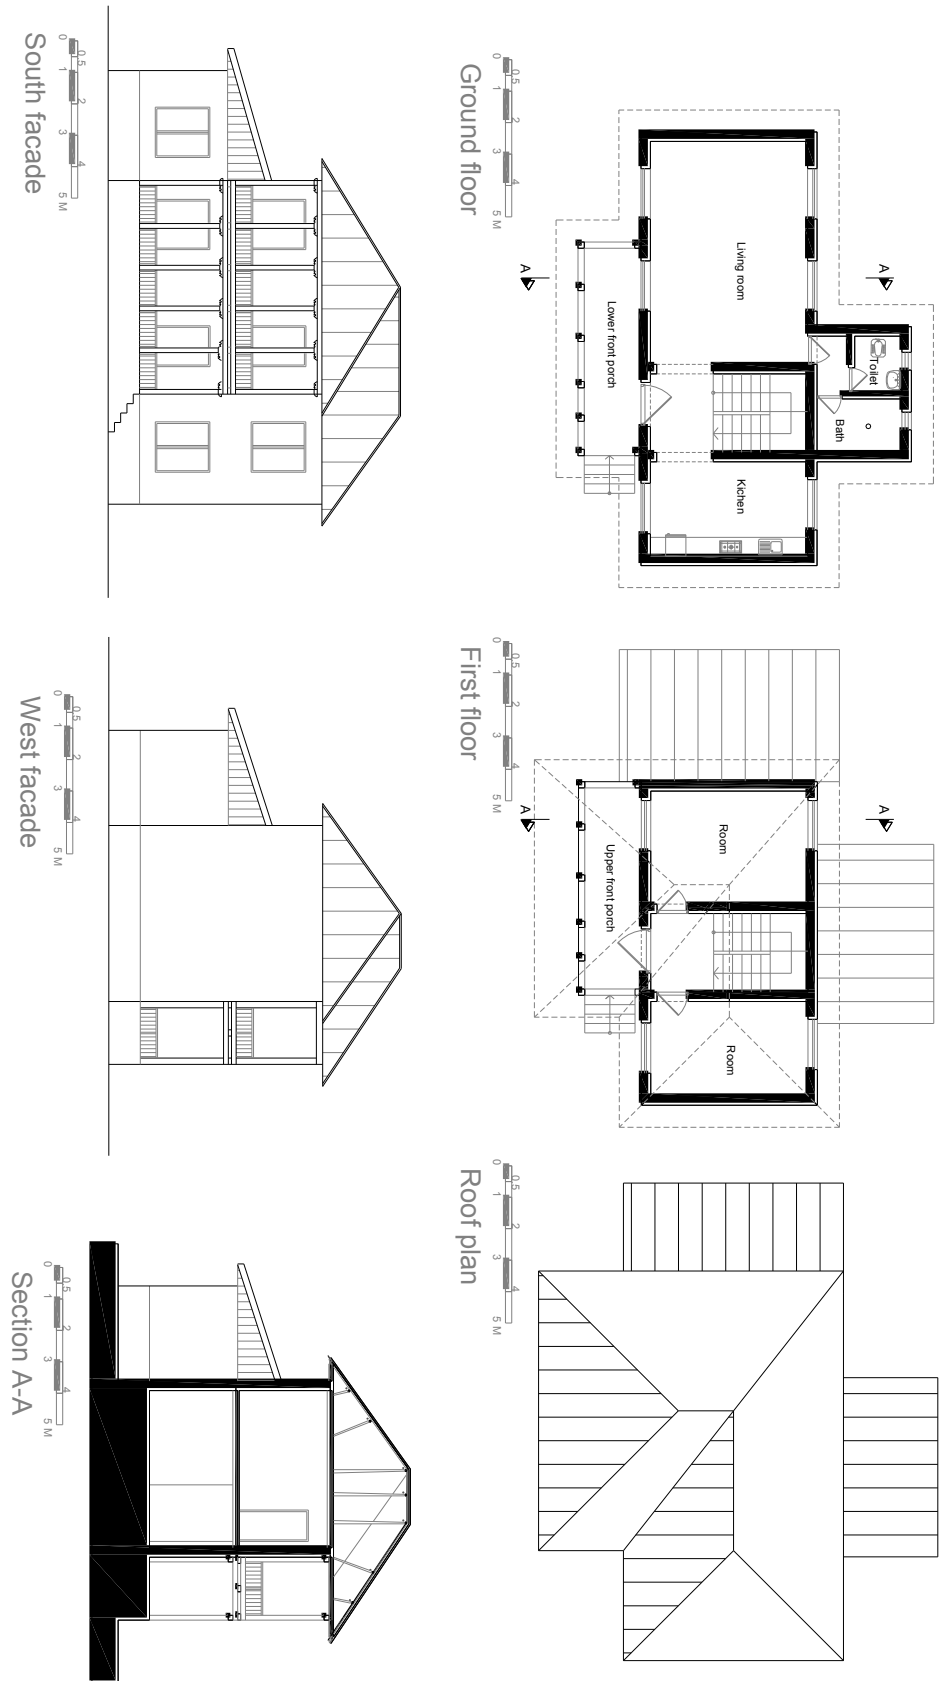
Plans, elevations and section of designed new house in Diva.
